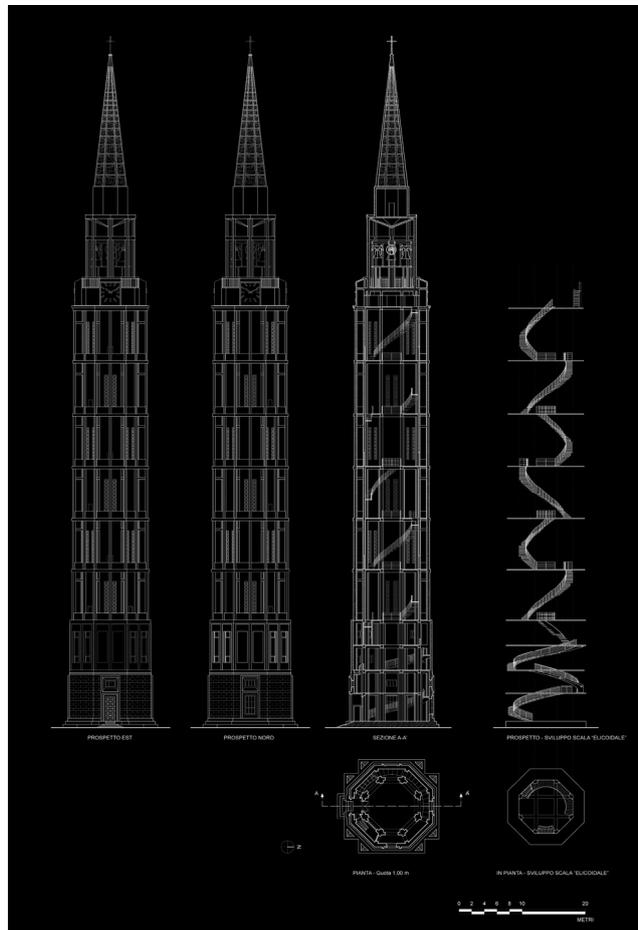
Floor plans, elevations, section and scale development of the bell tower. Graphic elaboration by Mohamed El Ouajjay.
